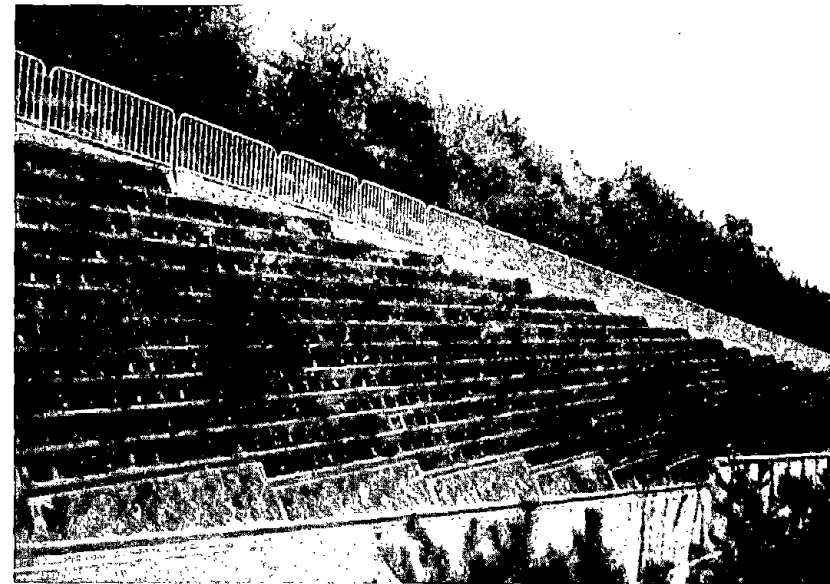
Undamaged crib retaining structure in Ashiya.
